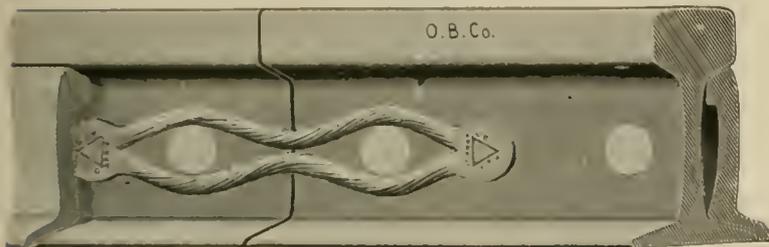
70 lb. T RAIL BONDED WITH ONE TYPE B FORM 2 BOND
